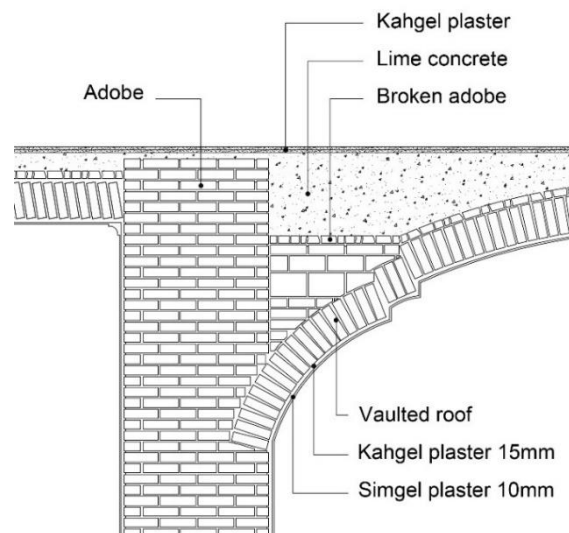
, up: Wall to roof joint in Yazd traditional houses, source: (YCHHTO 2013)
